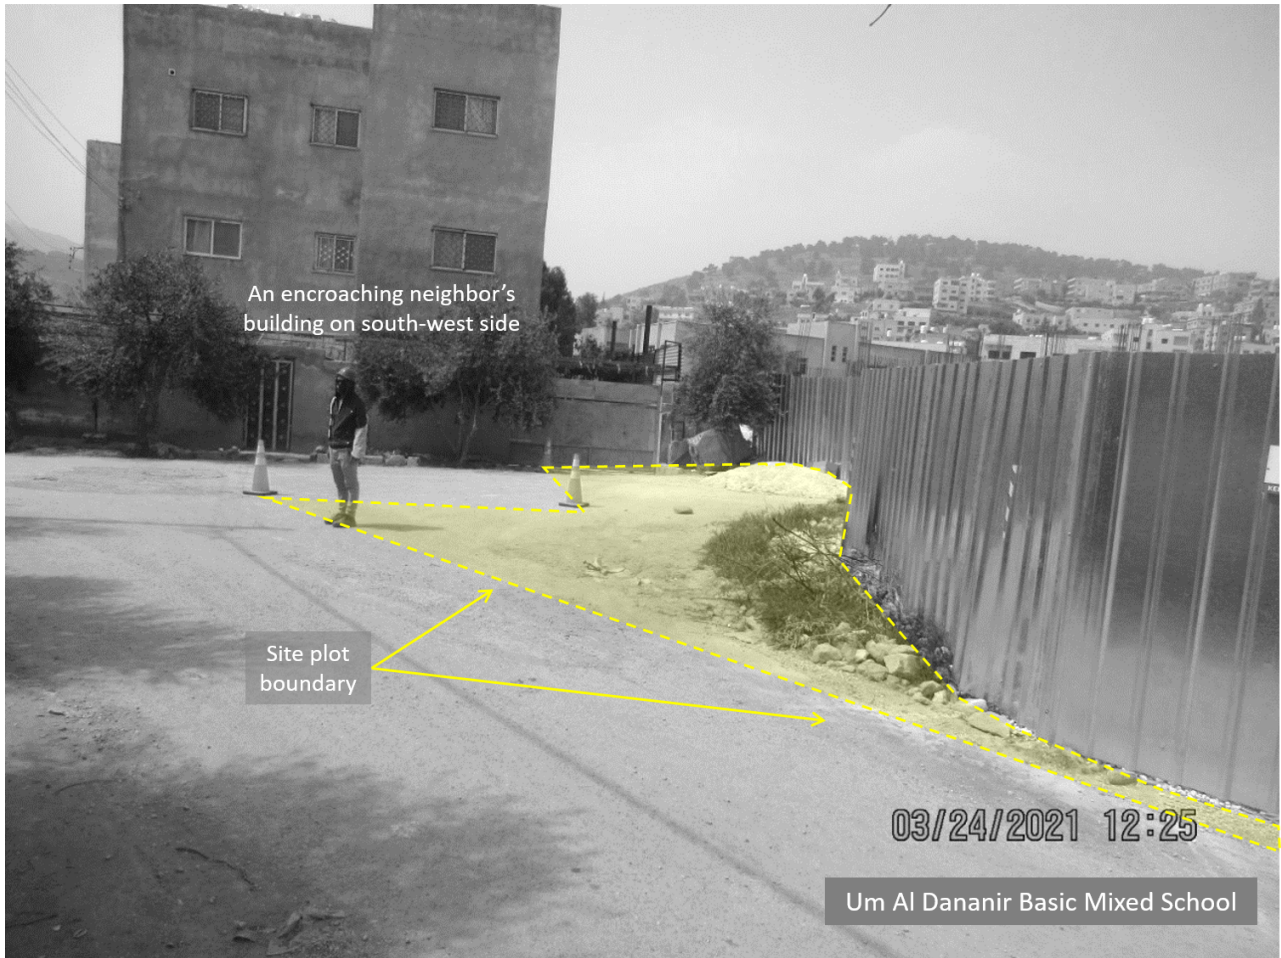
There is an encroachment of the existing neighbor's building toward the site
